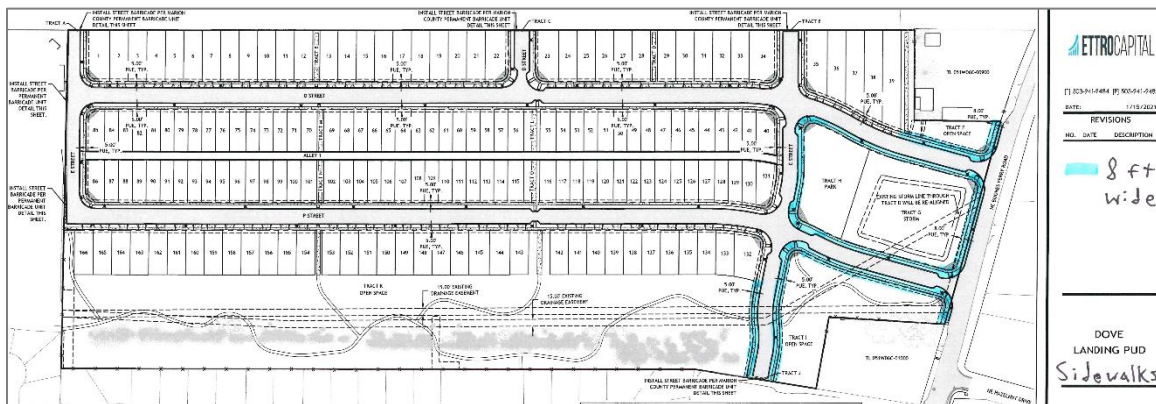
Sidewalks (blue: min 8 ft wide)
